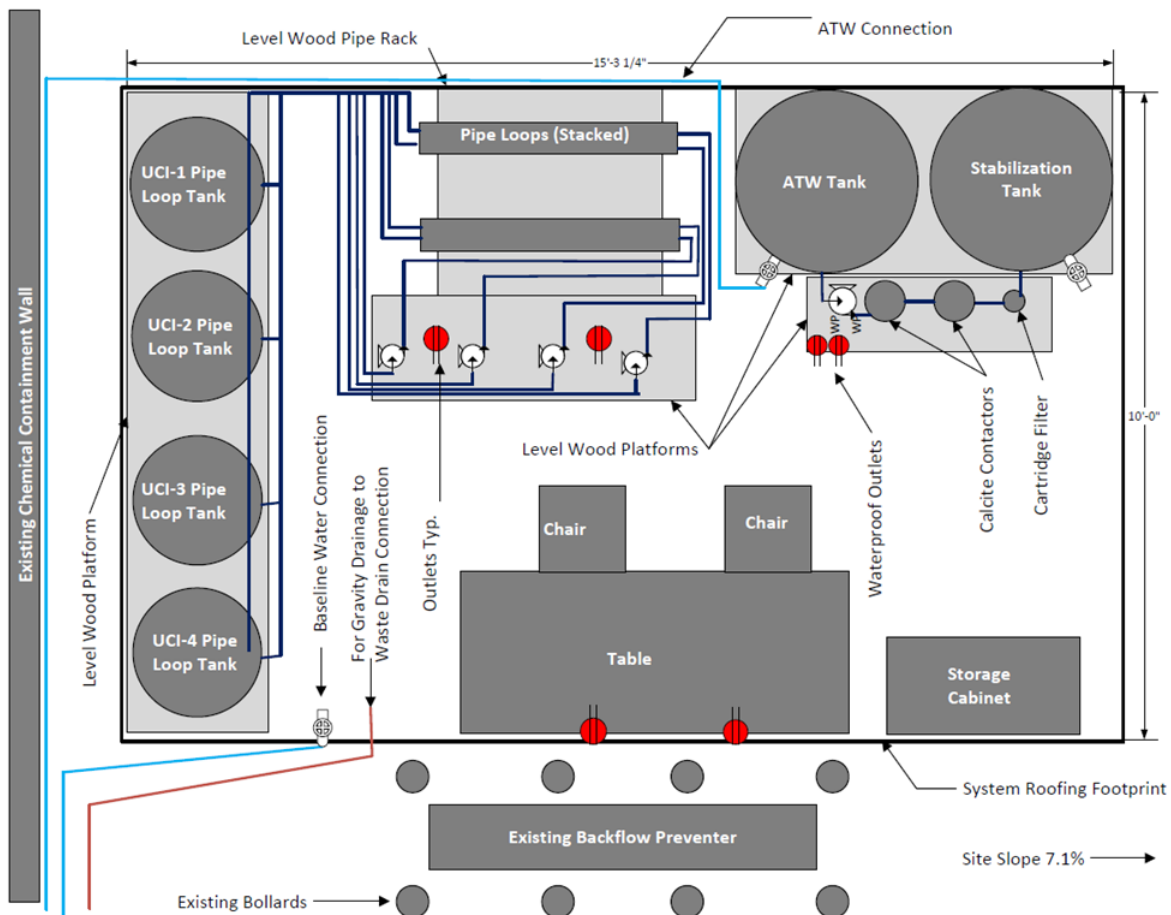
Plan View Layout of UCI Pipe Loop Pilot Testing System.
